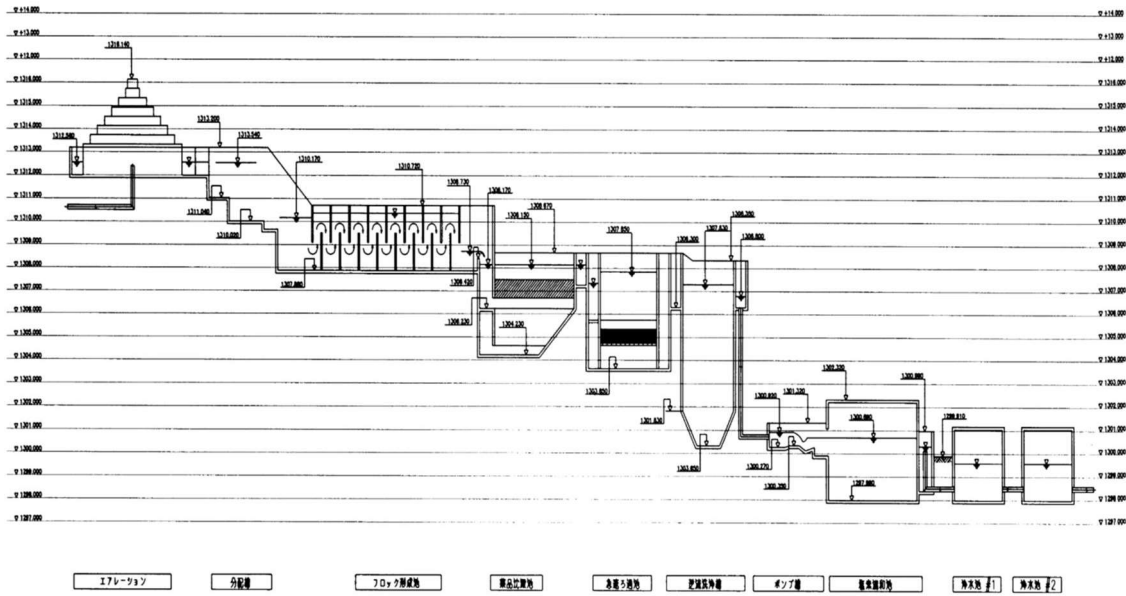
Picacho Water Treatment Plant Water Hydraulic Profile
